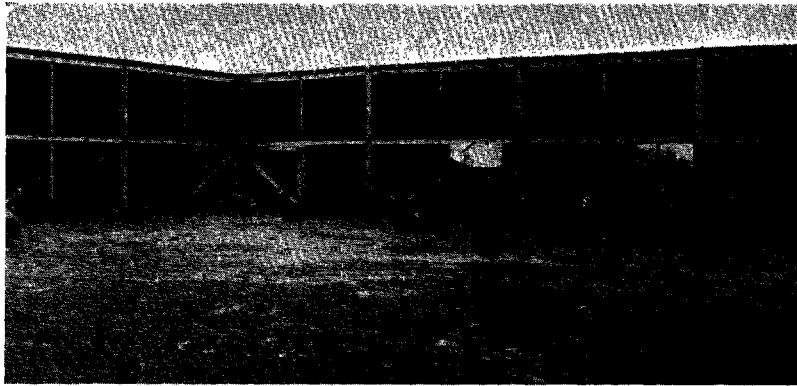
Shed type of shelter constructed of galvanized iron and used for the protection of breeding flocks.
